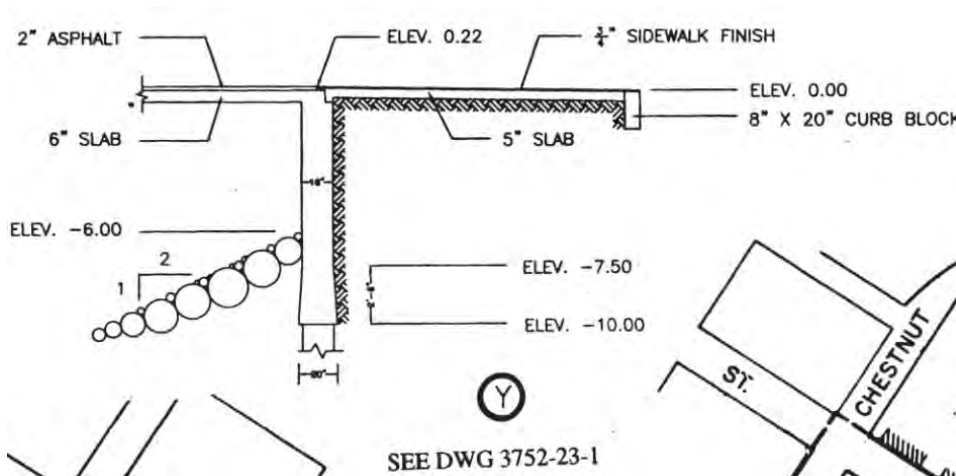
Seawall Section 4, Bulkhead Wall Type Y
